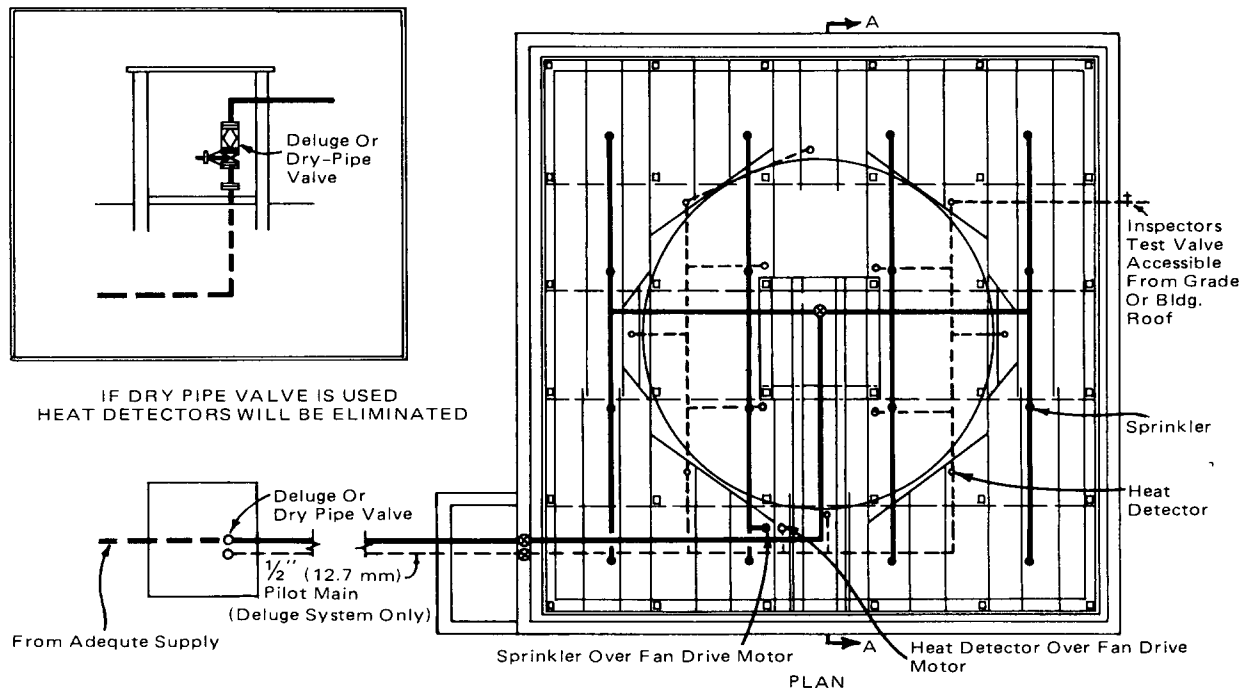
(c) Typical deluge or dry-pipe fire protection arrangement for counterflow towers.
